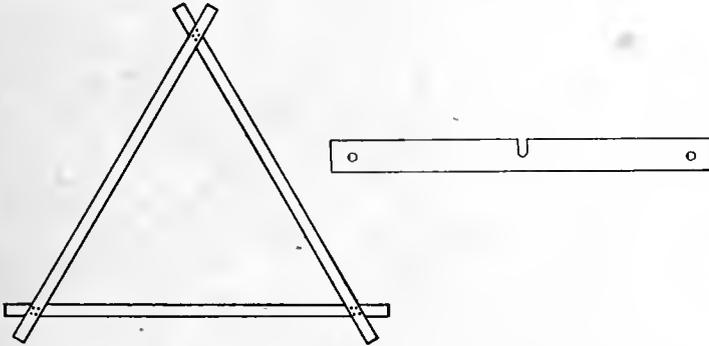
SIMPLE FORMS OF PLANTING BOARDS.
